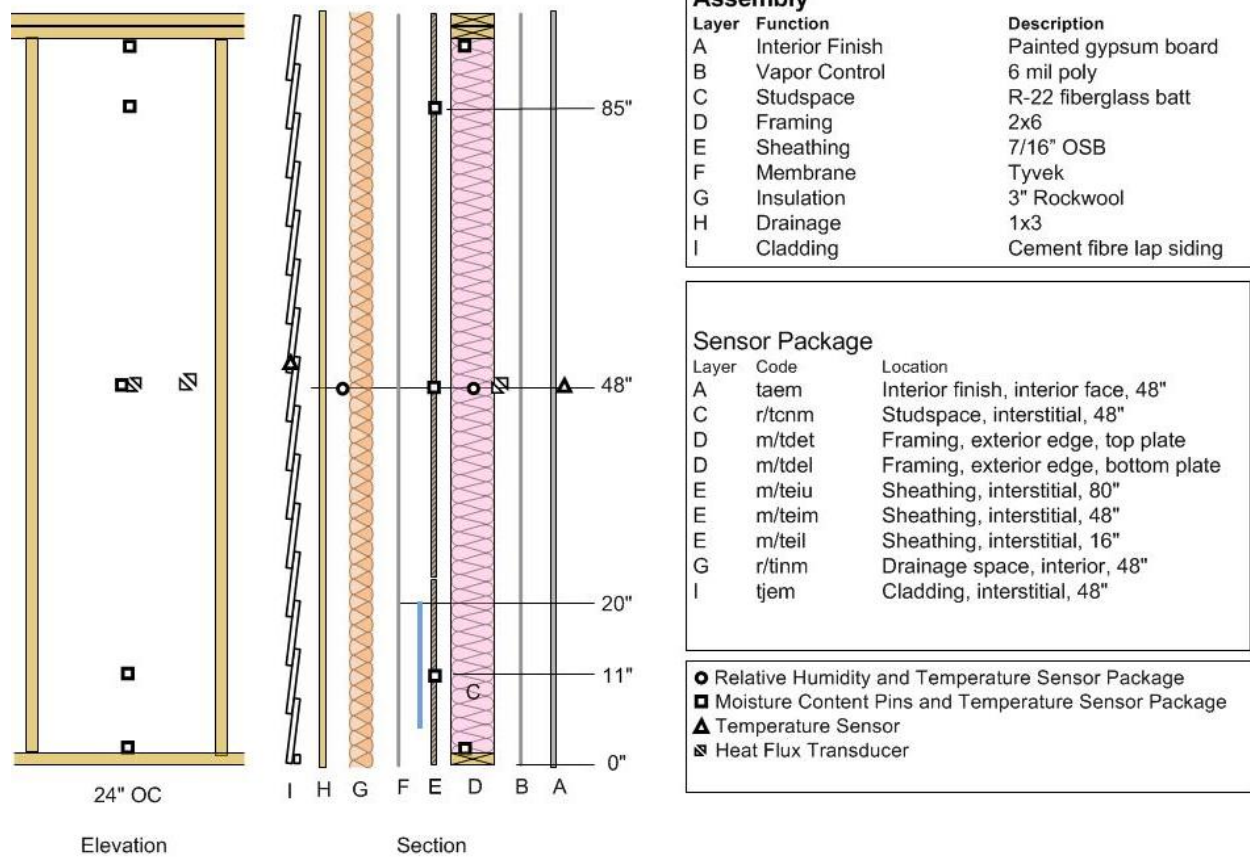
Elevation and exploded vertical cross-section of the center bay of the Rock Wool wall panel
